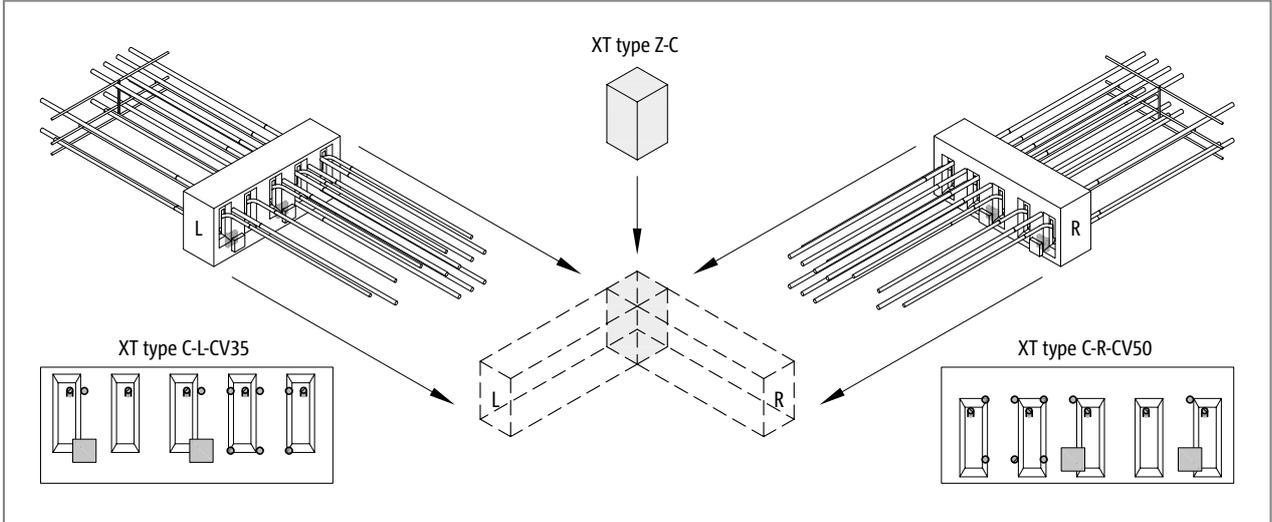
Schöck Isokorb® XT type C-L-CV35, XT type C-R-CV50: Arrangement at the corner using corner insulating element
